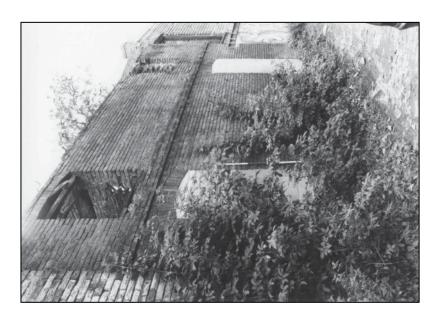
Building C, E elevation, looking W (photo 1/18) (top to left).
